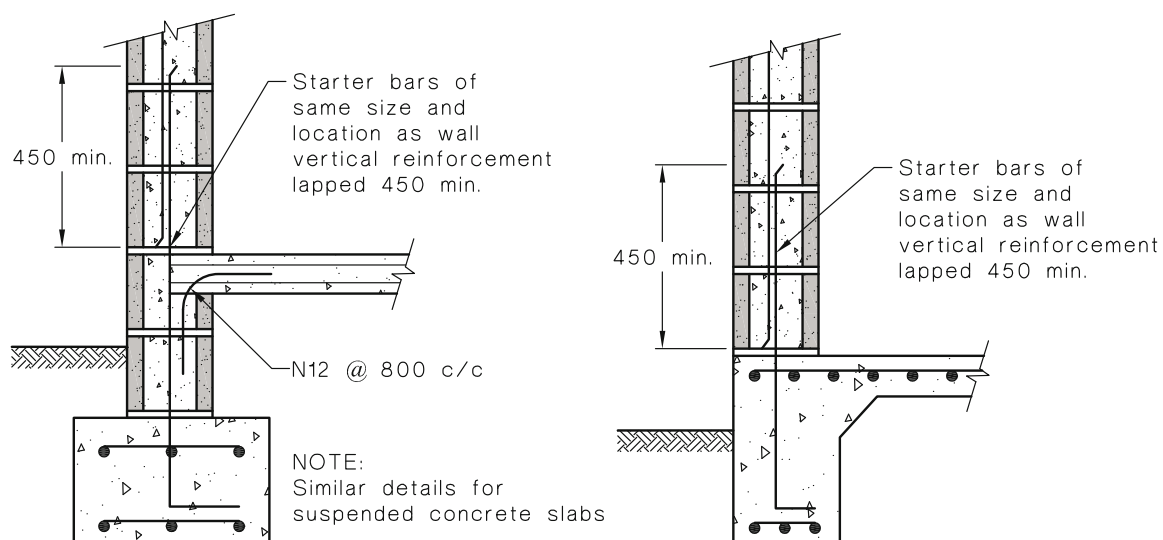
TYPICAL REINFORCEMENT LAYOUT
